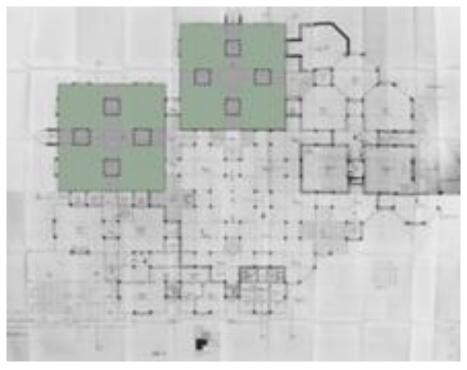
Adapted floor plan of the building in Diepnbeek, with highlighted grouping of rooms, by Nivelle, 1982.
